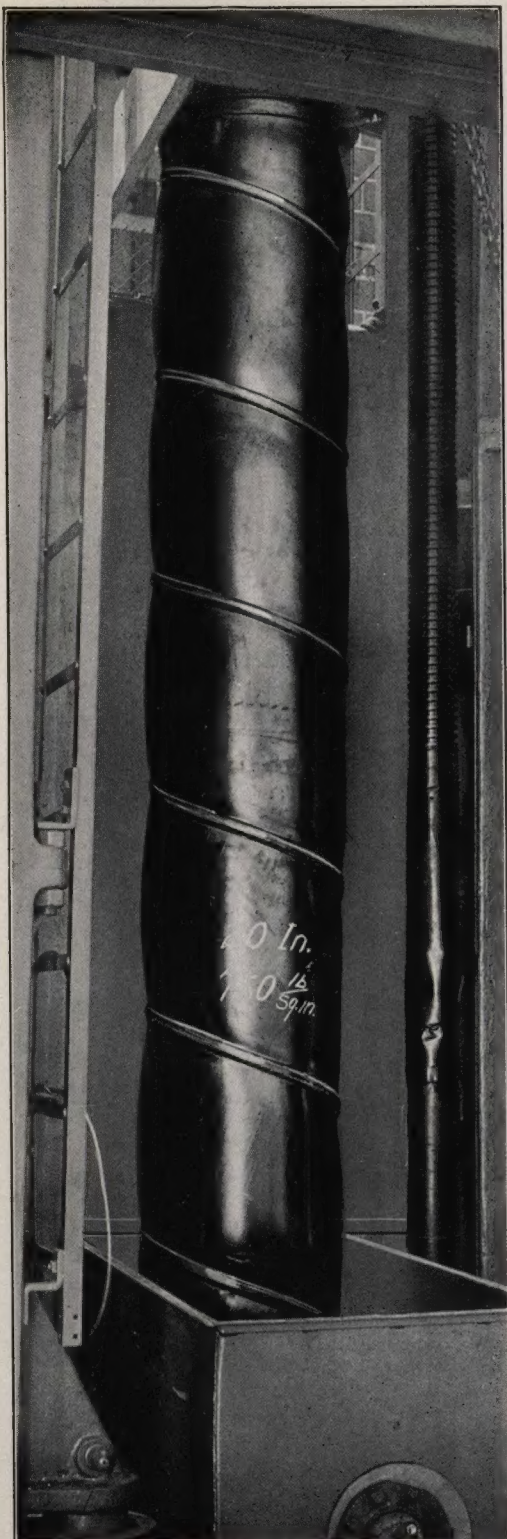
20-inch internal pressure specimen in testing machine during test
